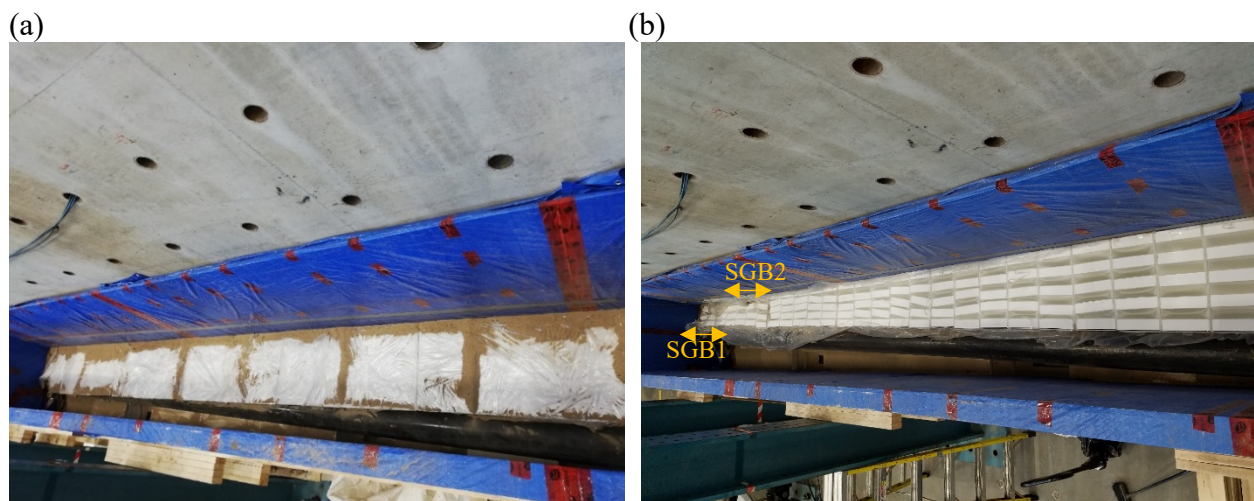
4: a) Test assembly at the end of the test; b) Deformed SGB at the end of the test.
